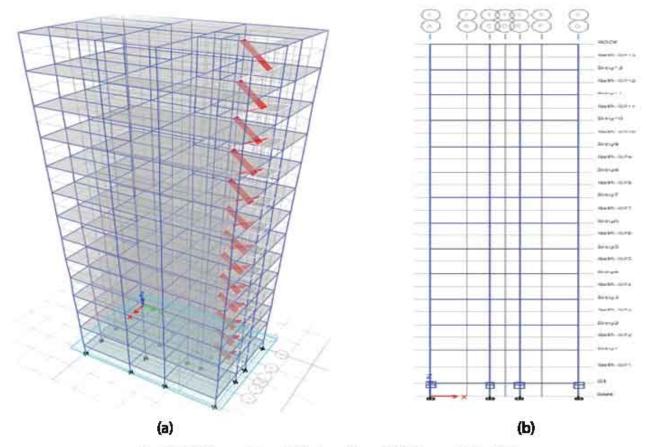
(a) 3D model and (b) elevation of 12 Storey RC building
